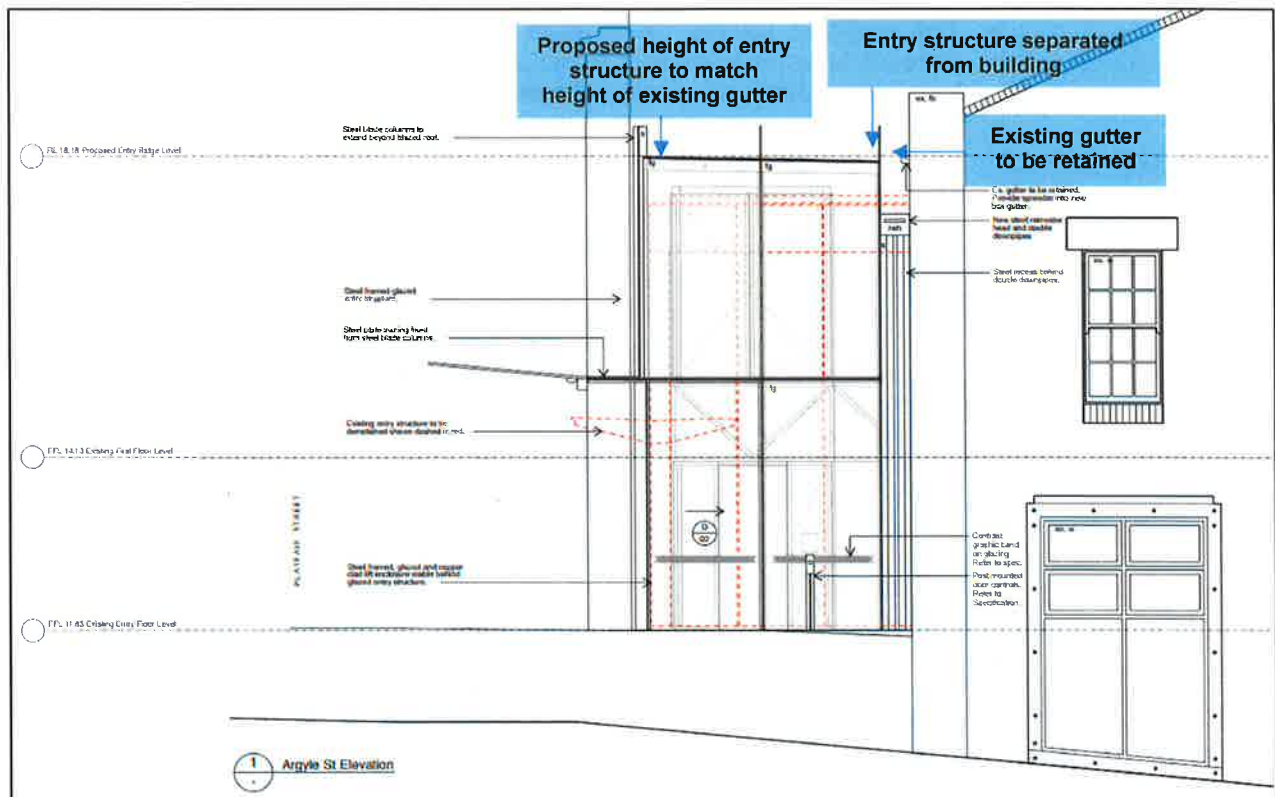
View of proposed entry structure as viewed from Argyle Street (Base source: Applicant's EIS)
